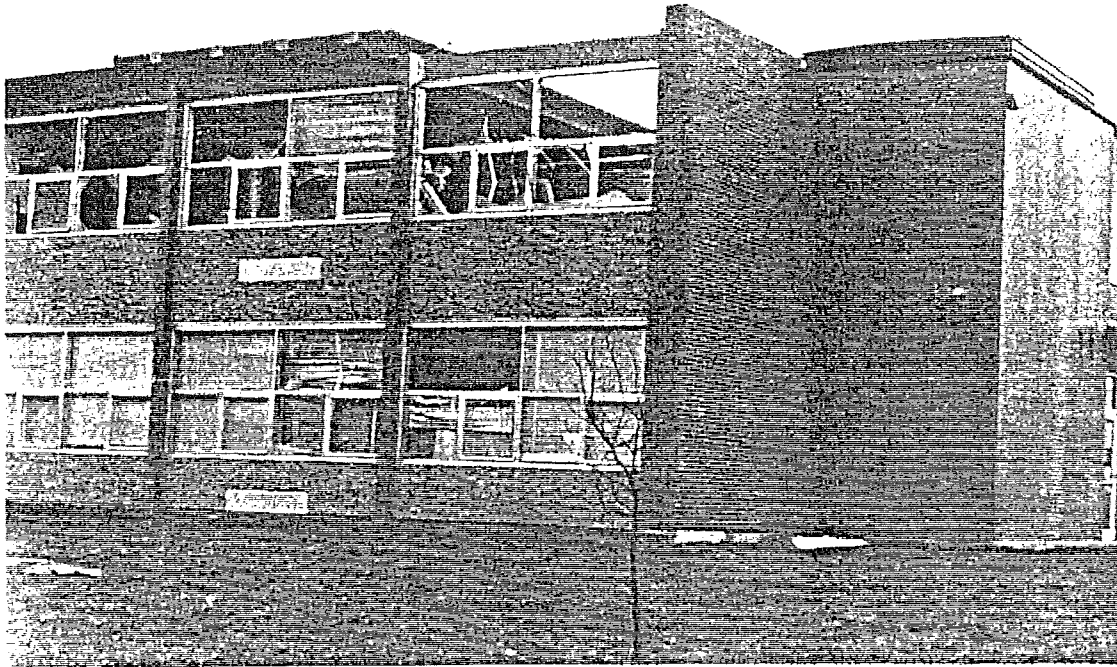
WEST JUNIOR HIGH SCHOOL, ROOF CORNER. Precast double-tee beams were uplifted. The two-story building did not sustain any other structural damage.
